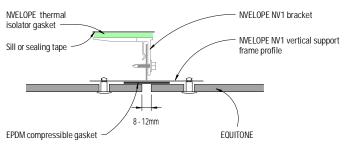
Open horizontal joint junction with vertical joint - Elevation
